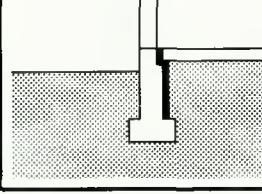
Slab-on-Grade Foundation with Exterior Insulation
